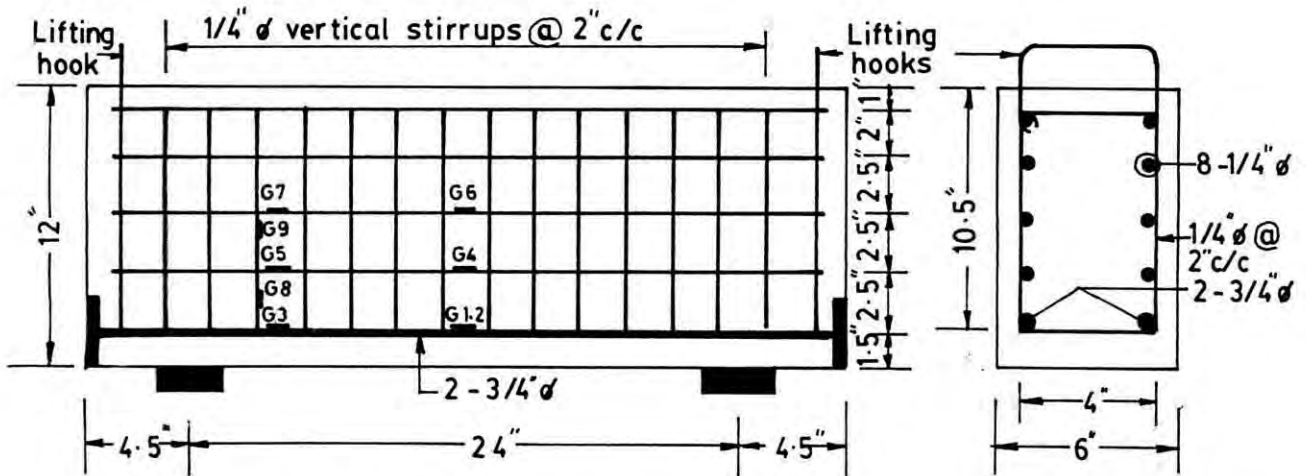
Reinforcement arrangement of beam DB-Q6
